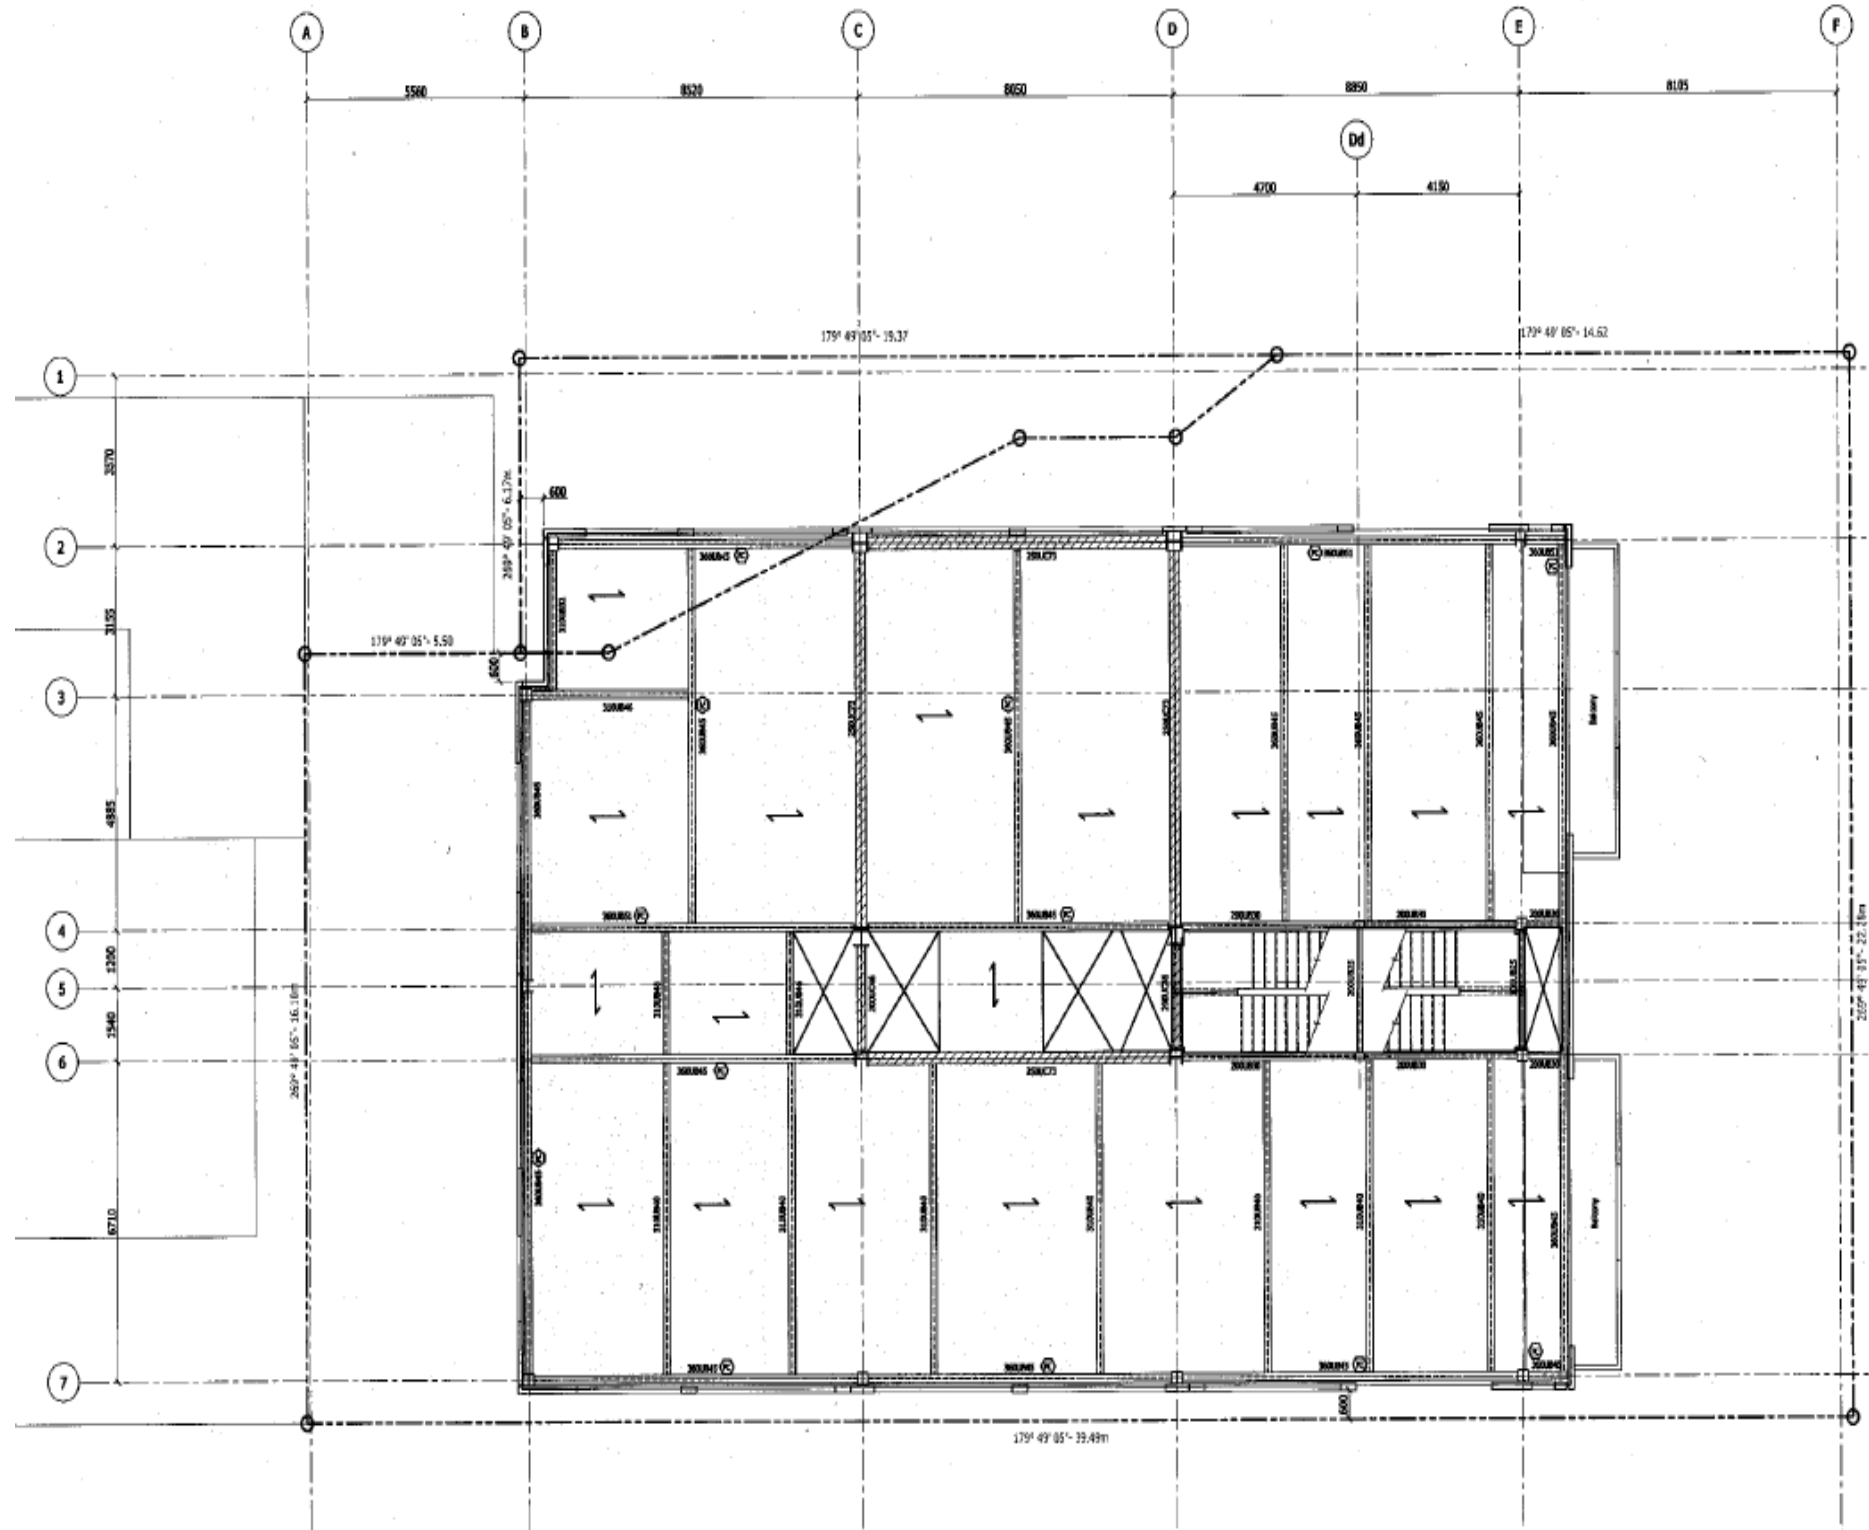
Structural Plan Level 18 (Christchurch City Council 2016c)
